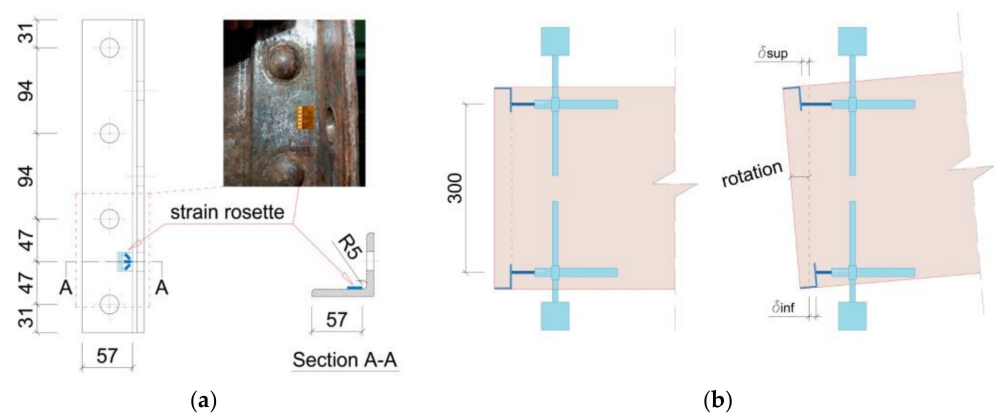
Instrumentation of stringer-floor beam connection specimens (all dimensions in mm). (a) Strain rosette. (b) Displacement transducers.
